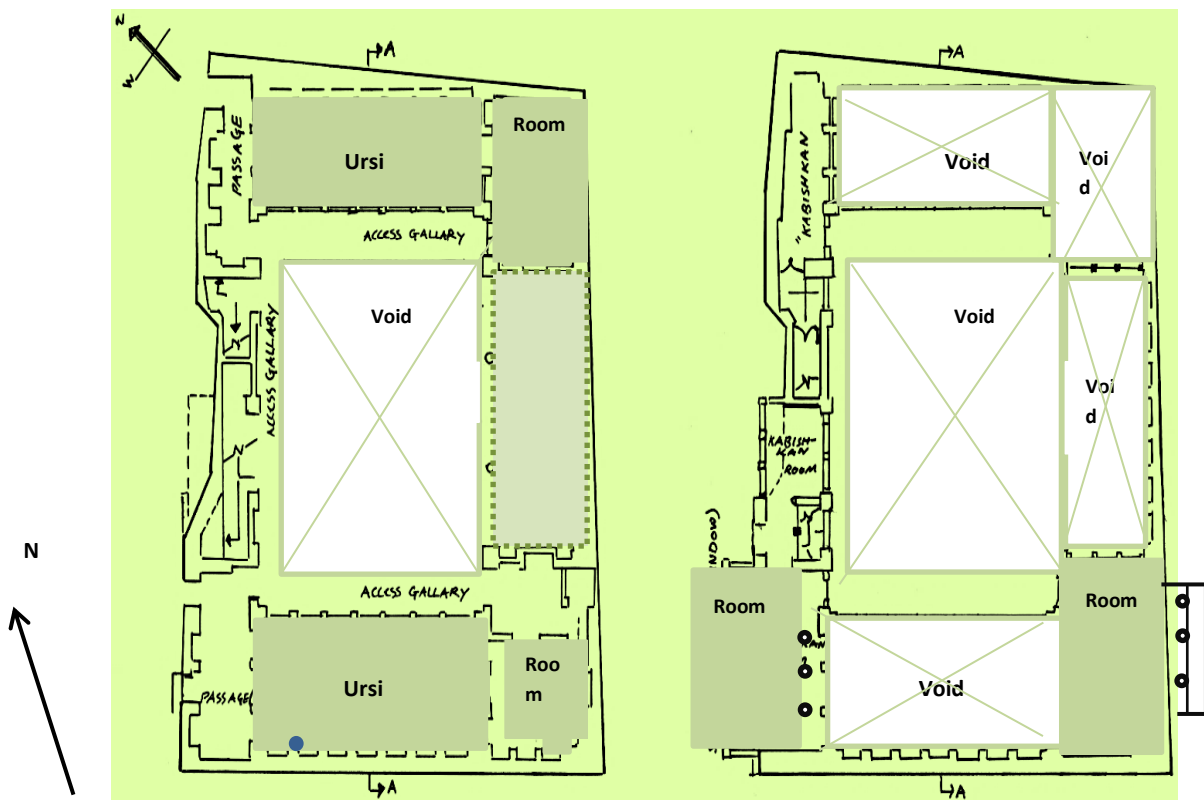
First floor level plan and second floor level plan (Researcher) Scale: 1:50
